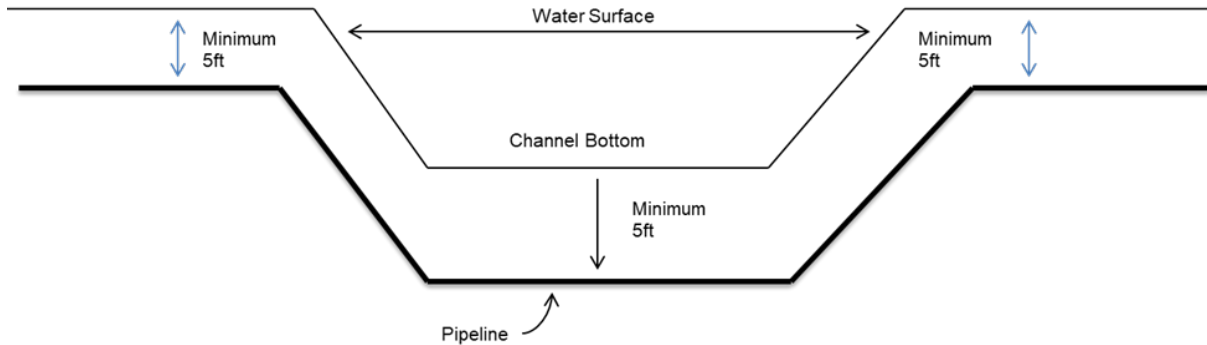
Figure C. Typical schematic for Private Channels and Open Bays demonstrating pipeline placement requirements.
